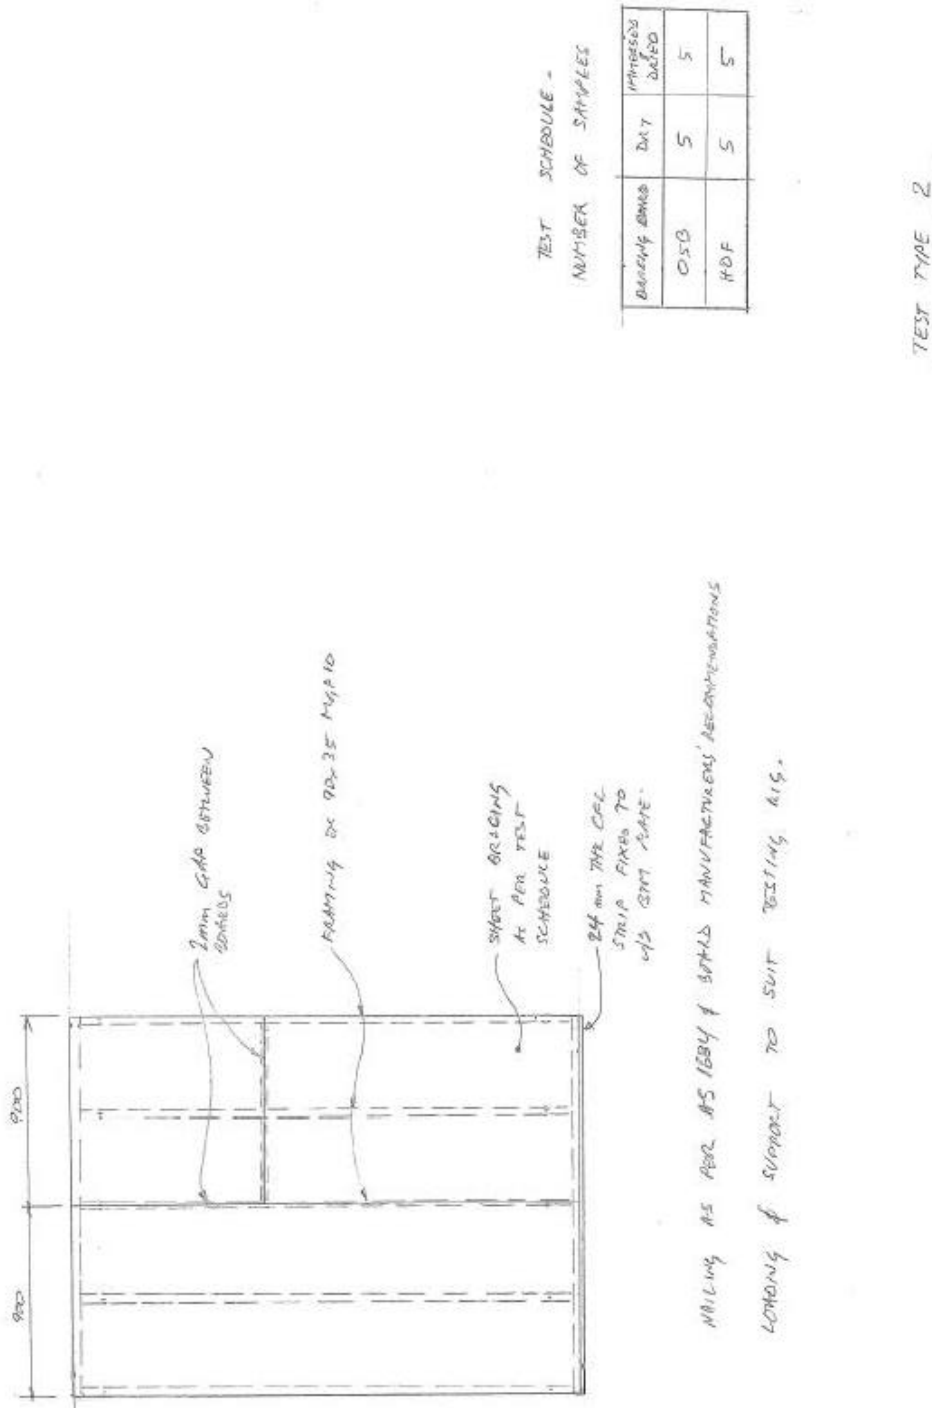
CONSTRUCTION DETAILS OF THE SHOWER SAMPLES
